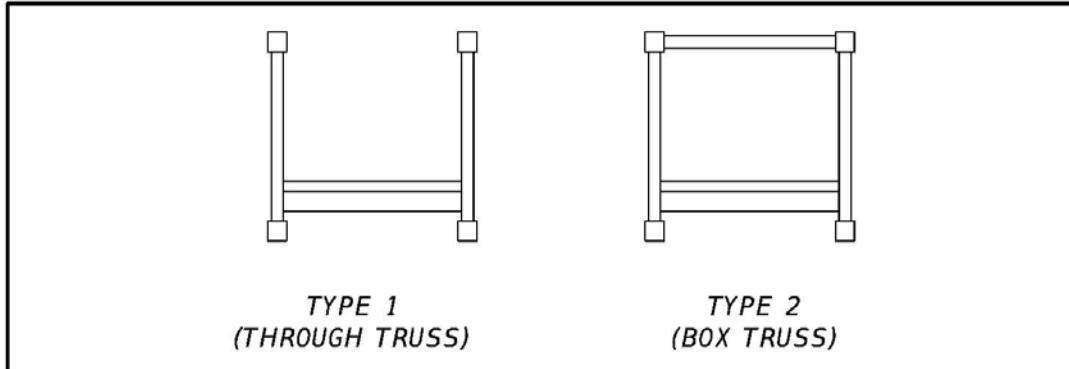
Prefabricated Pedestrian Standard Bridge Cross-Sections
